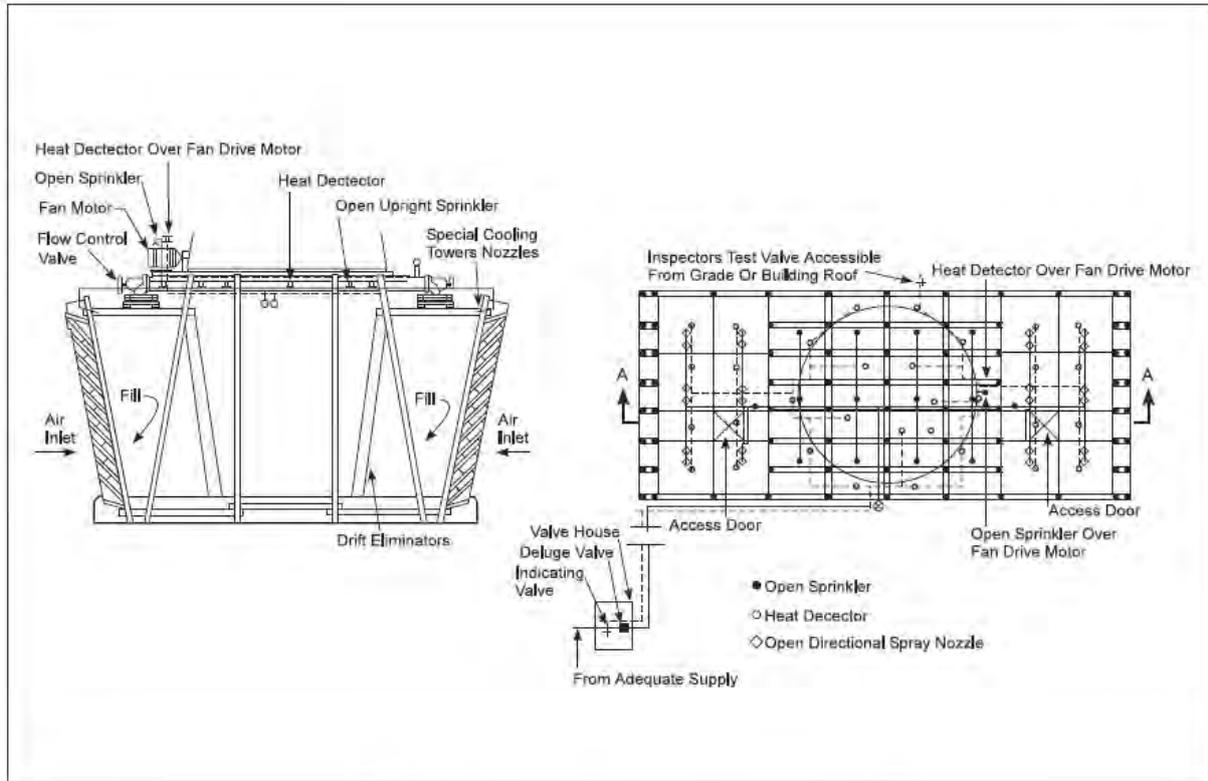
Typical deluge fire protection arrangement for crossflow cooling towers
